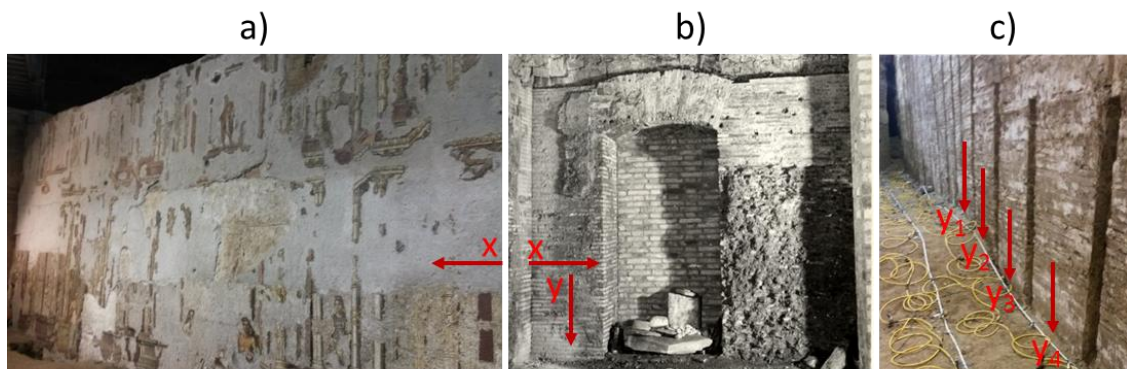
The three investigated walls: a) "Mosaics" wall, b) "Nymphaeum" wall, c) "Trajan" wall
